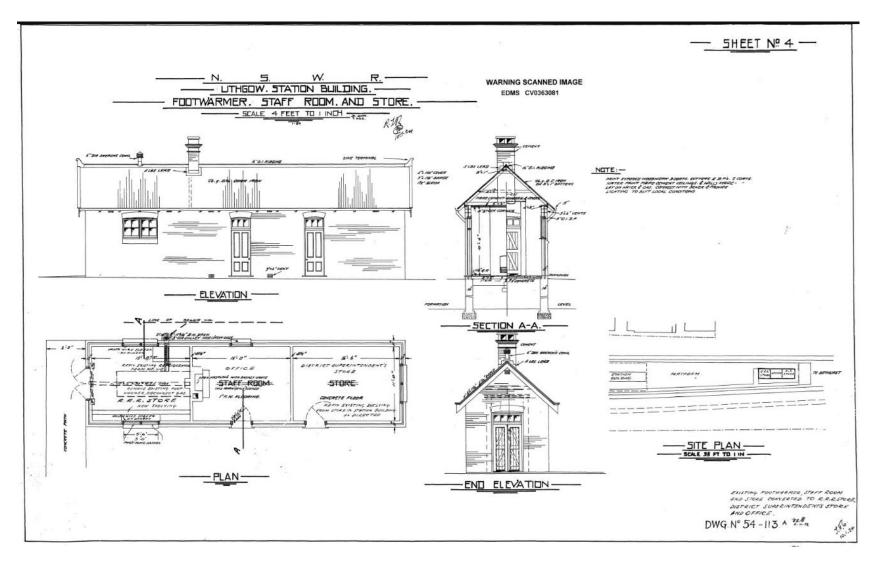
Plan of Lithgow Station footwarmer building in 1924, location of building on platform indicated in bottom-right corner of figure 15
